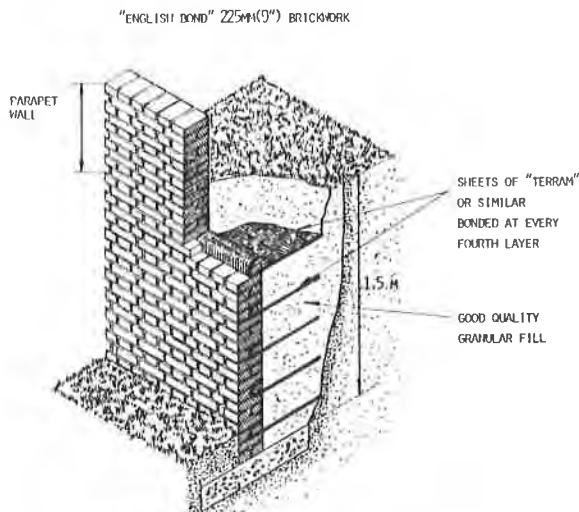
FABRIC REINFORCED BRICK RETAINING WALL
